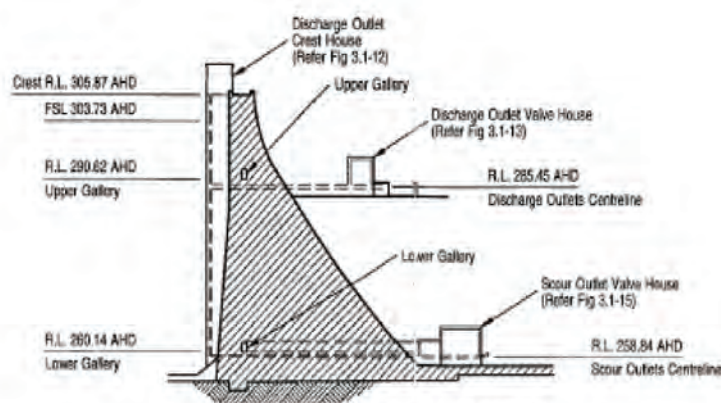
Cross-section of the Cordeaux Dam Wall (Source: WaterNSW, 2015)
